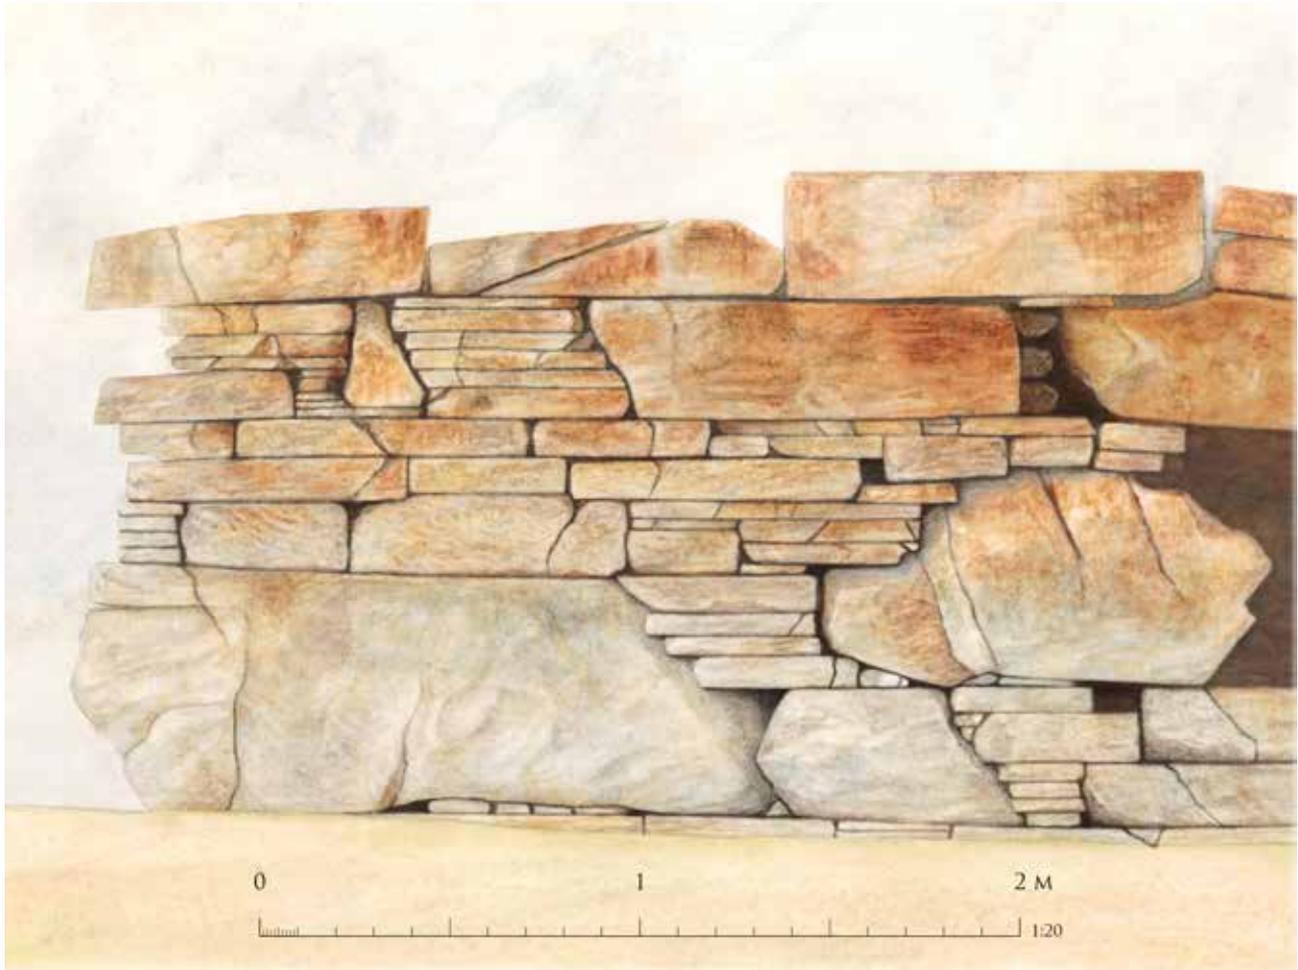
b. Detail of wall construction, outer face on south side of the site. Photograph (3a) by Patrik Klingborg, drawing (3b) by Jesper Blid.
